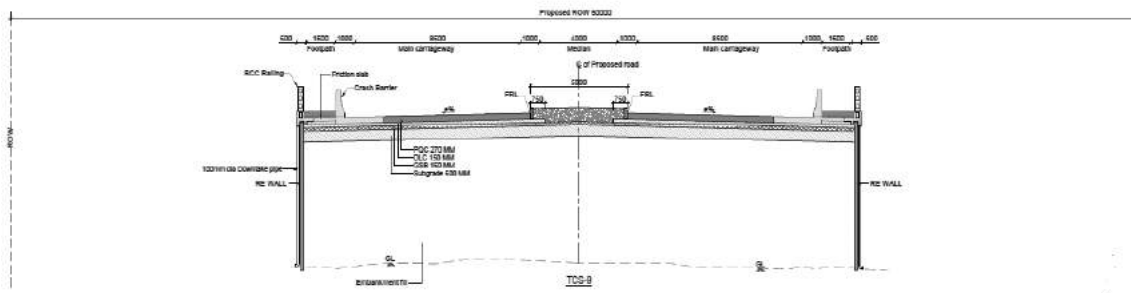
TCS-9 TCS Of Approach to Road Over Bridge
